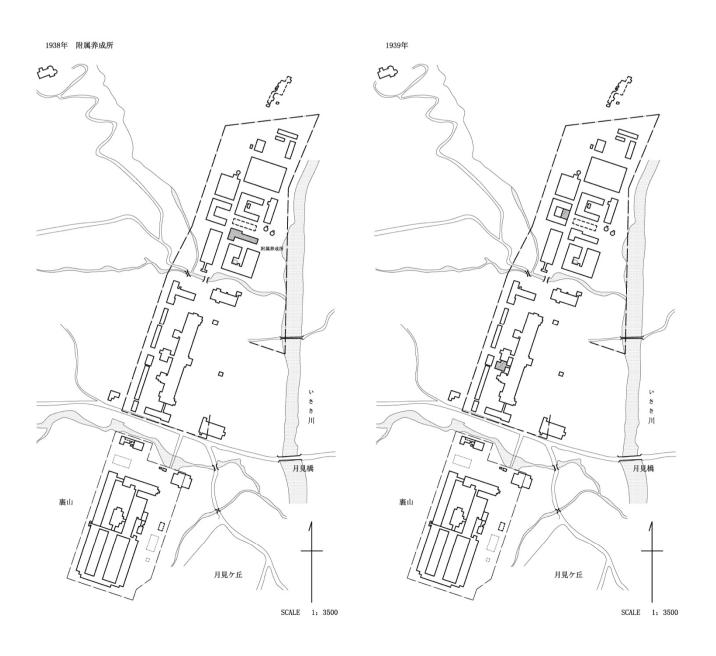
Retraced Campus Site plans of the RCE before 1945
